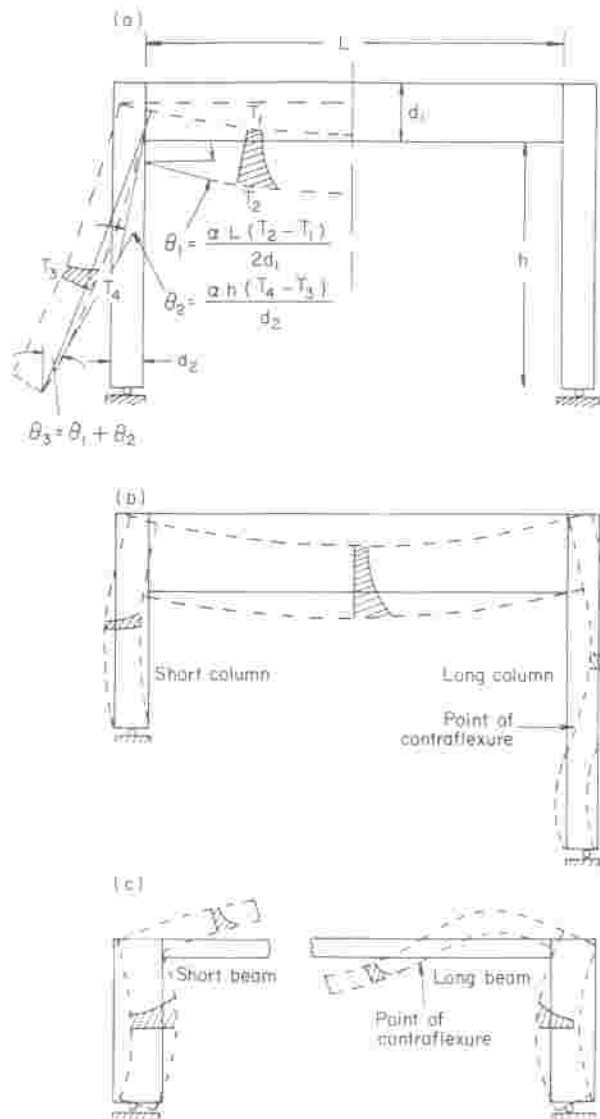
Deflection shapes of portal frame due solely to thermal bowing, (a) Unrestrained column feet, (b) beam dominant, column feet position fixed and (c) column dominant, column feet position fixed.
